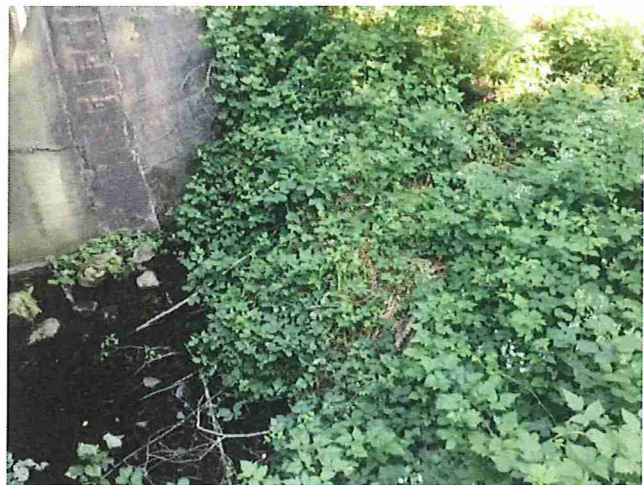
Old wooden bridge covered with debris immediately upstream of the Senkler bridge June 29
